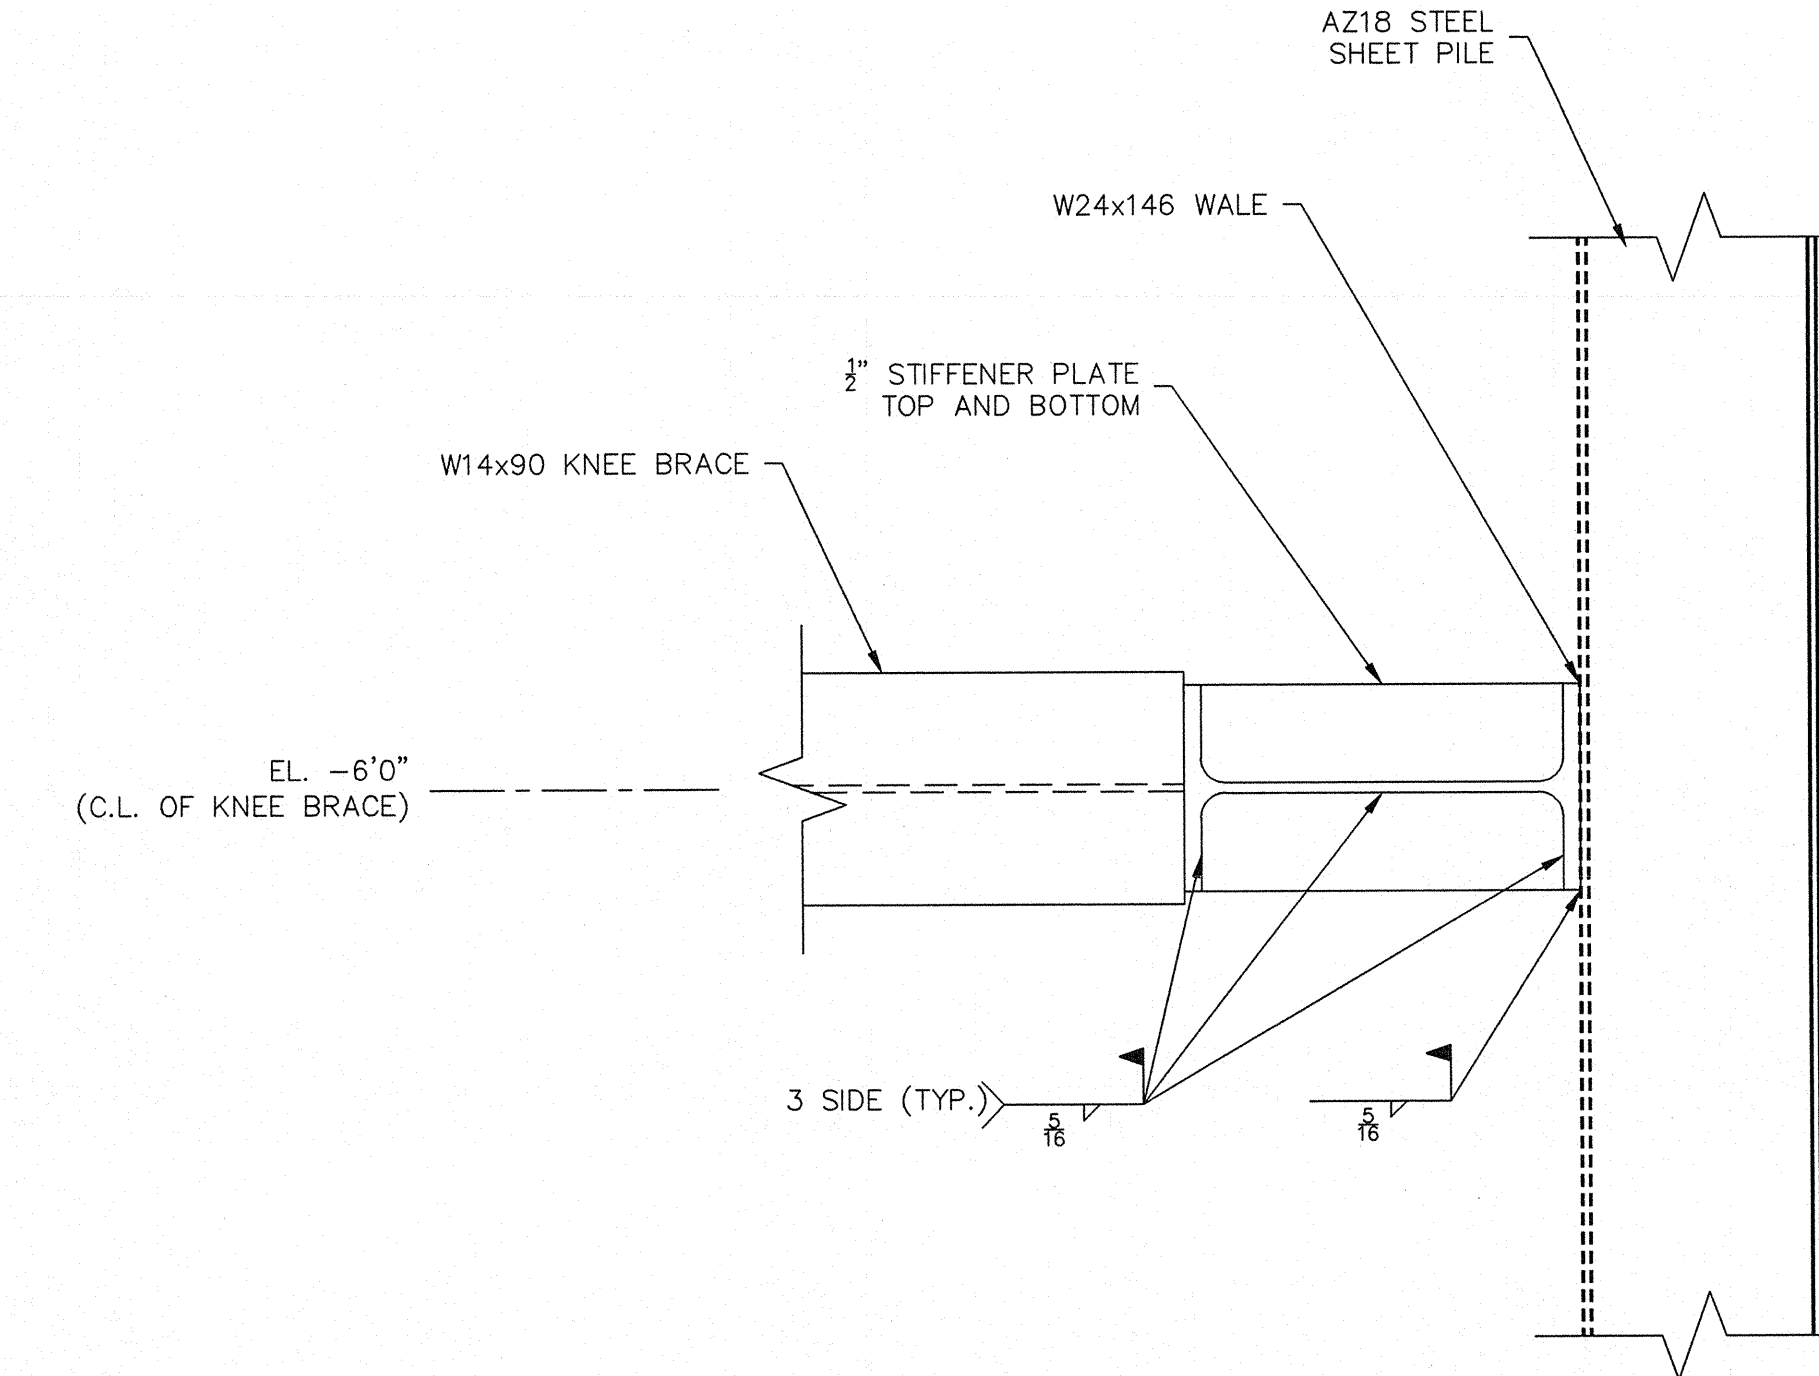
TYPICAL WALE CONNECTION @ STRUT (SECTION VIEW)
